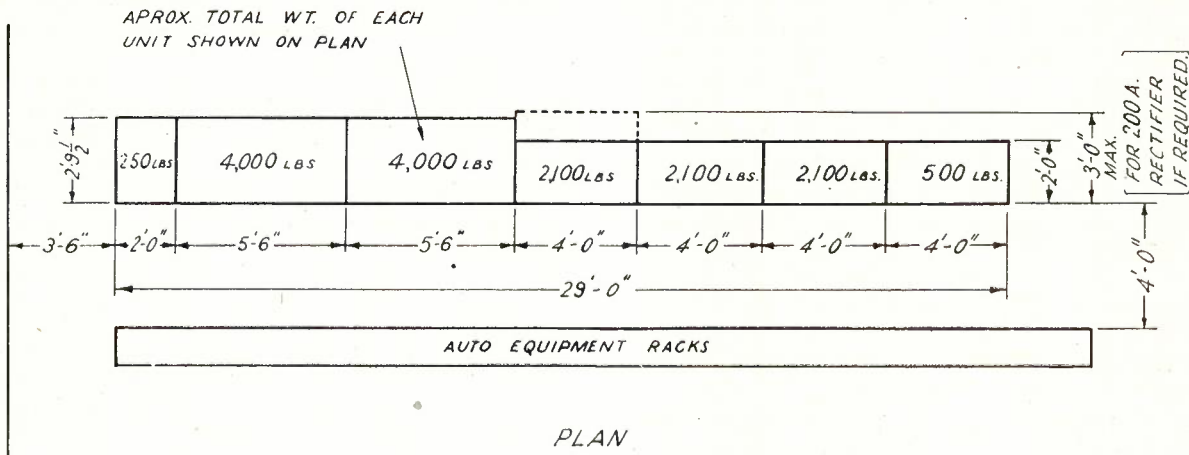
Typical layout of power plant in same room as communication equipment.
